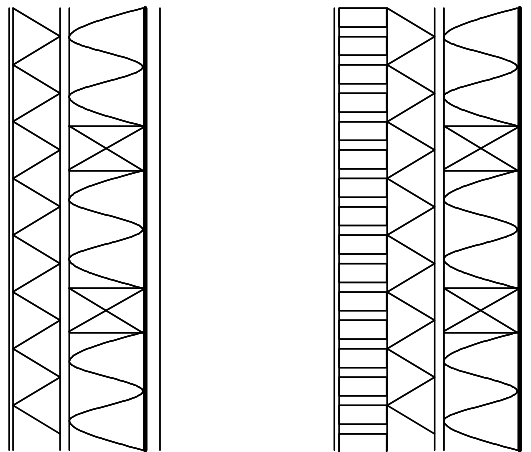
Schematic of the constructions of the light (left) and heavy (right) façades. The structure of the light façade from left (outside) to right (inside): 3-5 mm rendering, 50 mm polystyrene, 9 mm gypsum, 145 x 45 mm wood studs c/c 600 and 145 mm mineral wool, 0.2 mm vapour barrier. The only difference between the light and heavy constructions is the layer of bricks between the rendering and the polystyrene thermal insulation in the heavy façade.
